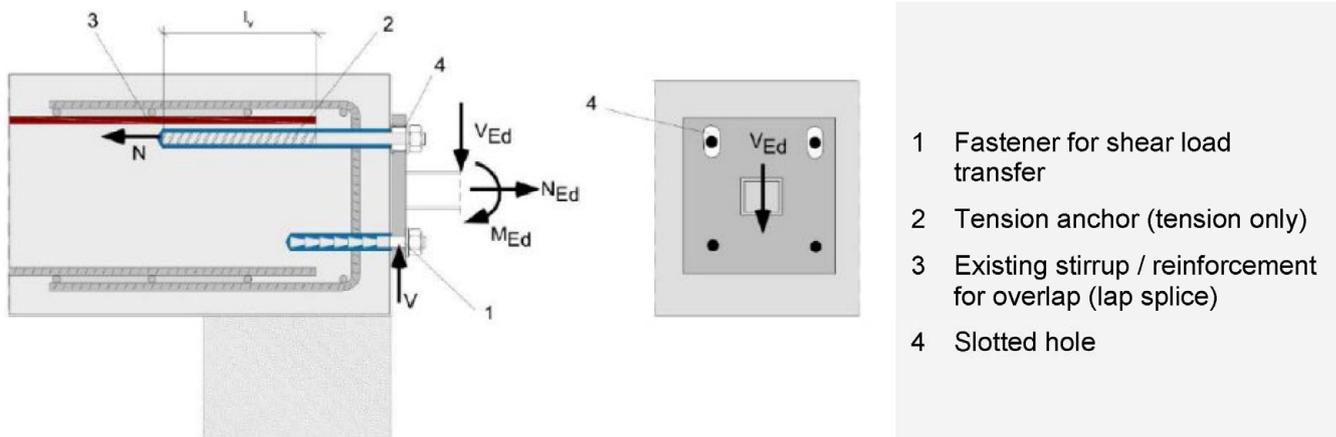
Lap of the anchoring of guardrail posts for anchoring of cantilevered building components. In the anchor plate, the drill holes for the tension anchors have to be designed as slotted holes with axial direction to the shear force.
